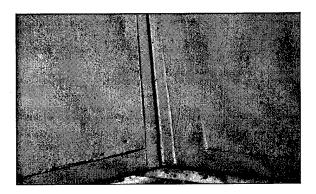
Finished sidewalk with broomed surface, troweled edges, and control joints.
